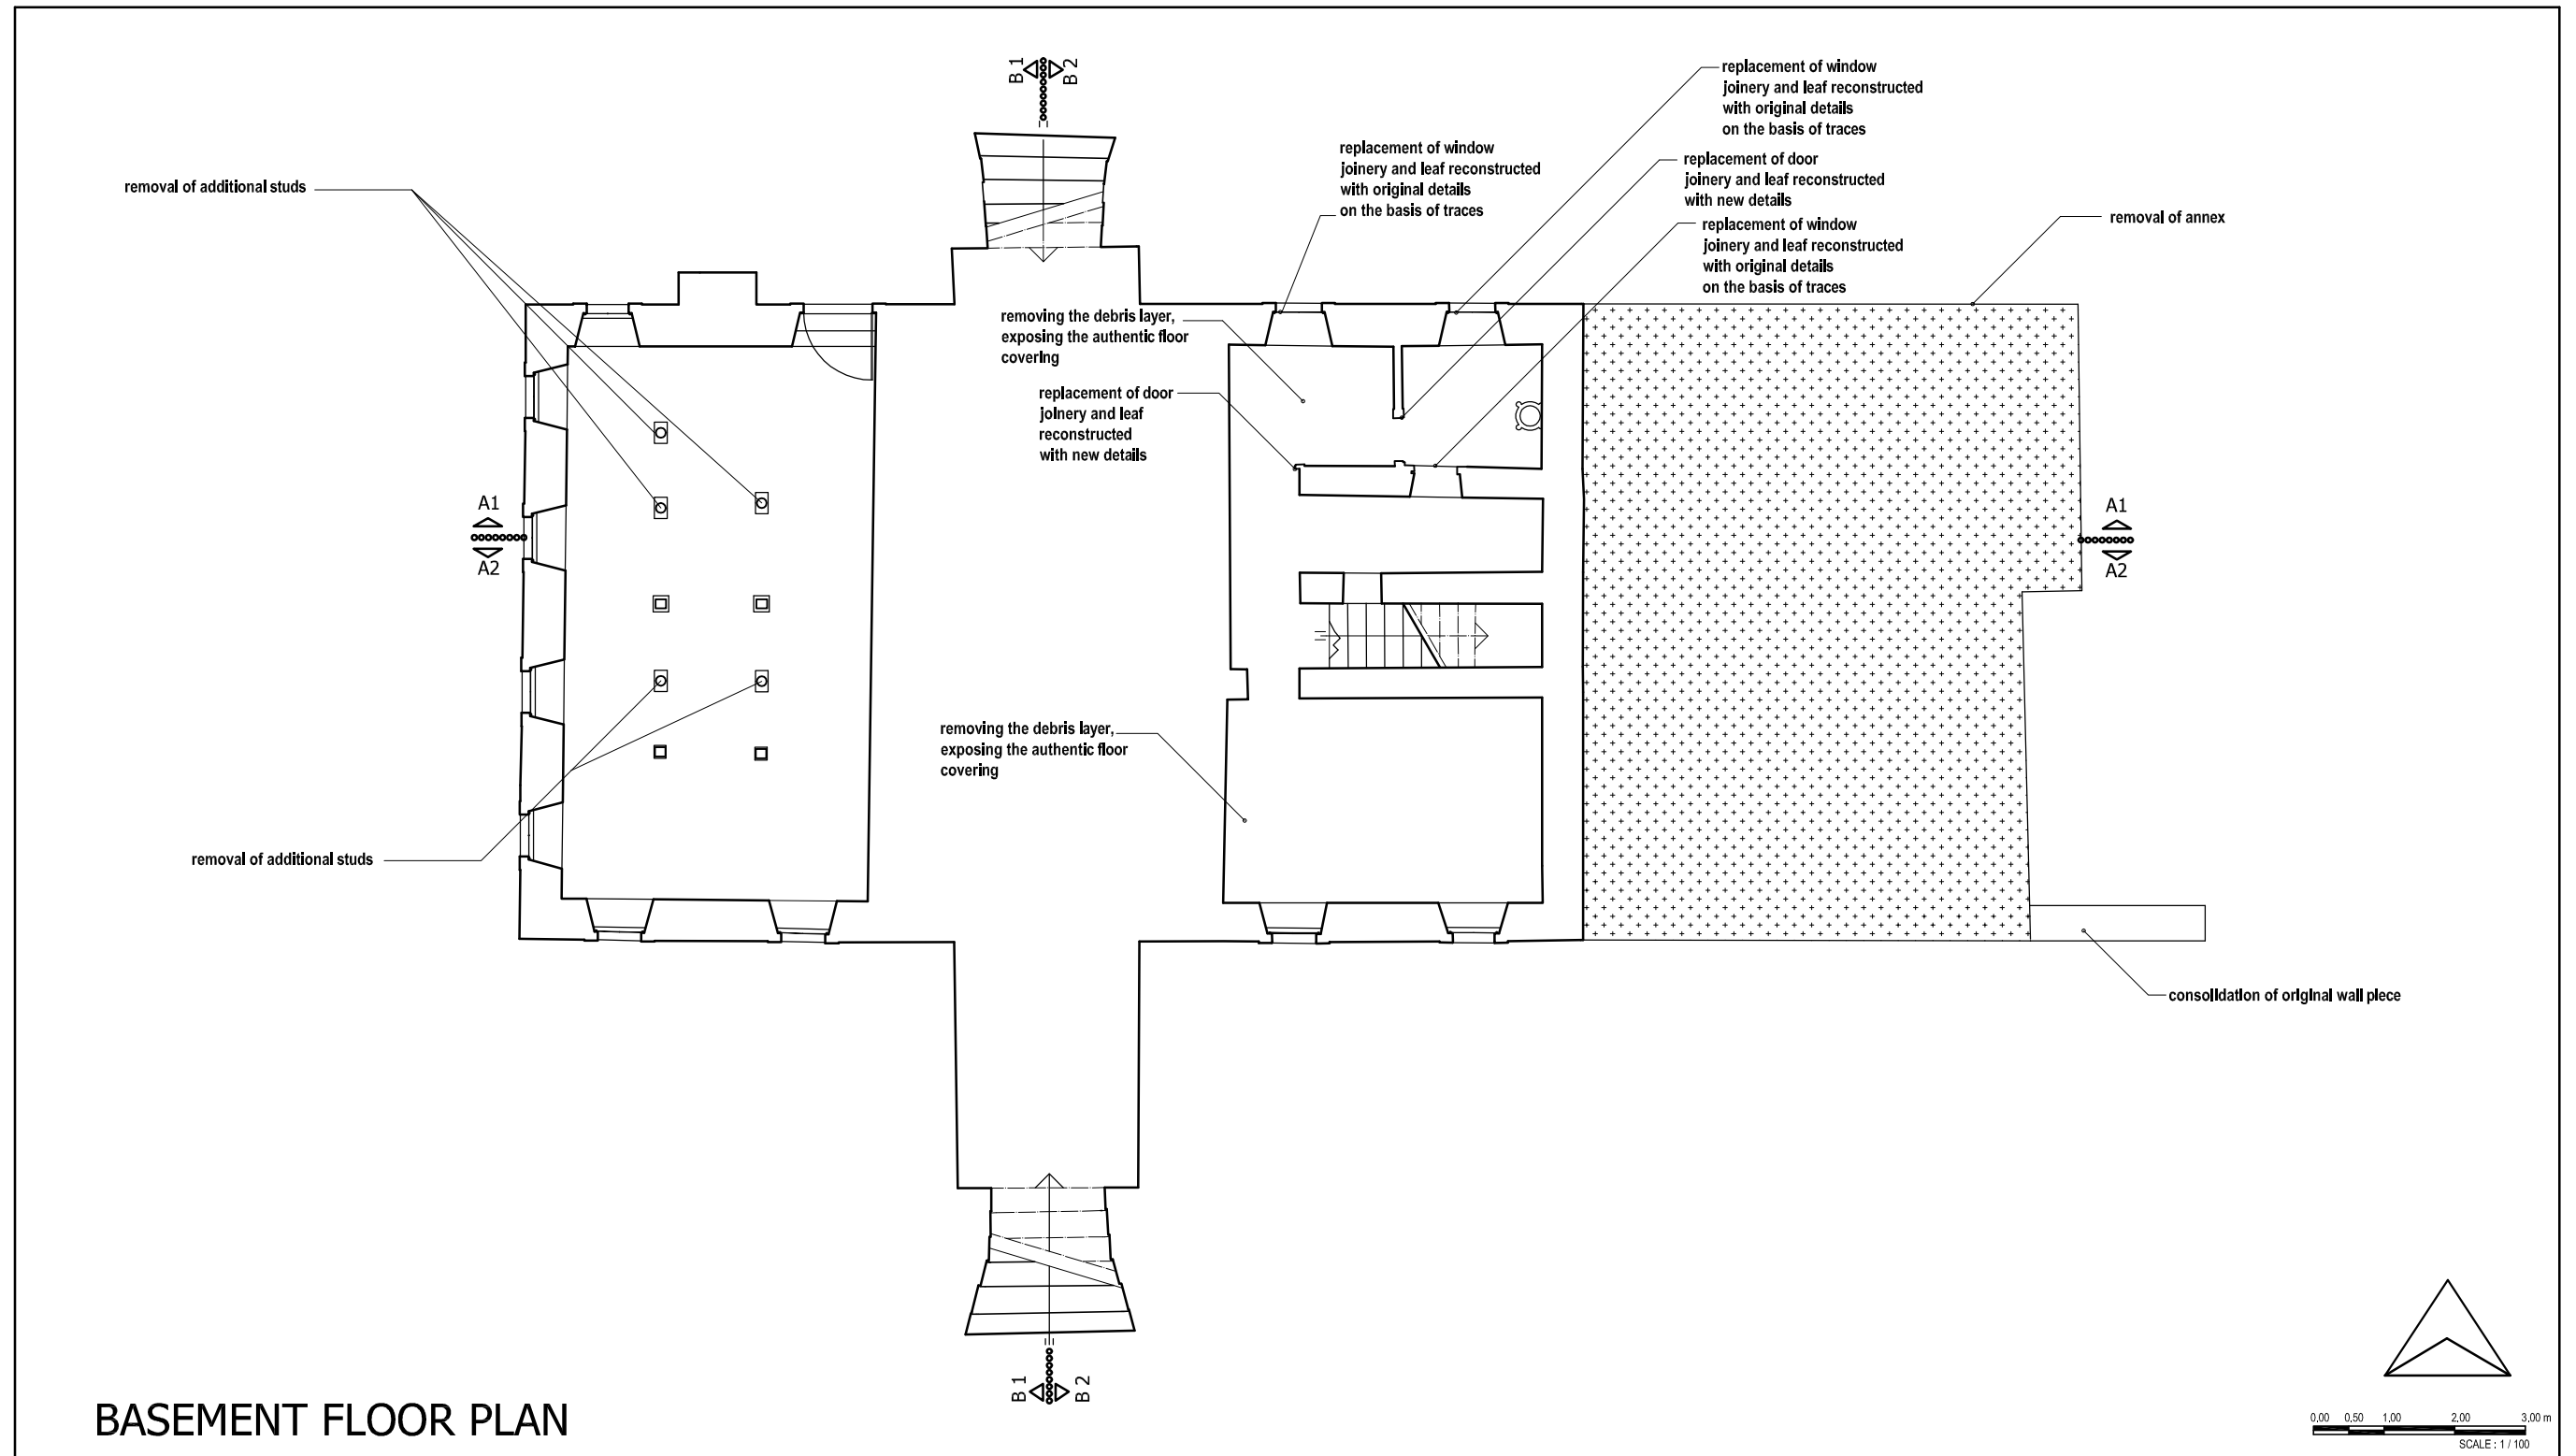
Measures for Ethics of Conservation - Basement Floor Plan
